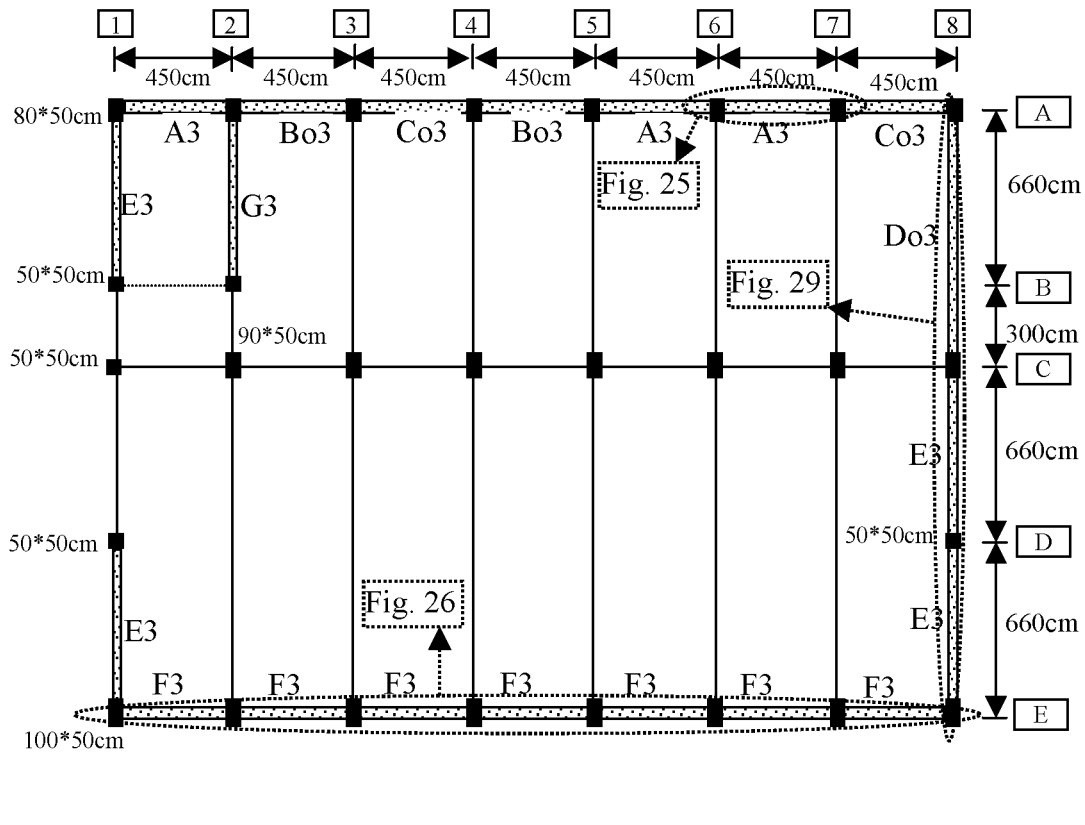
c. Plan of Top Story, Columns, and Infill Walls.
